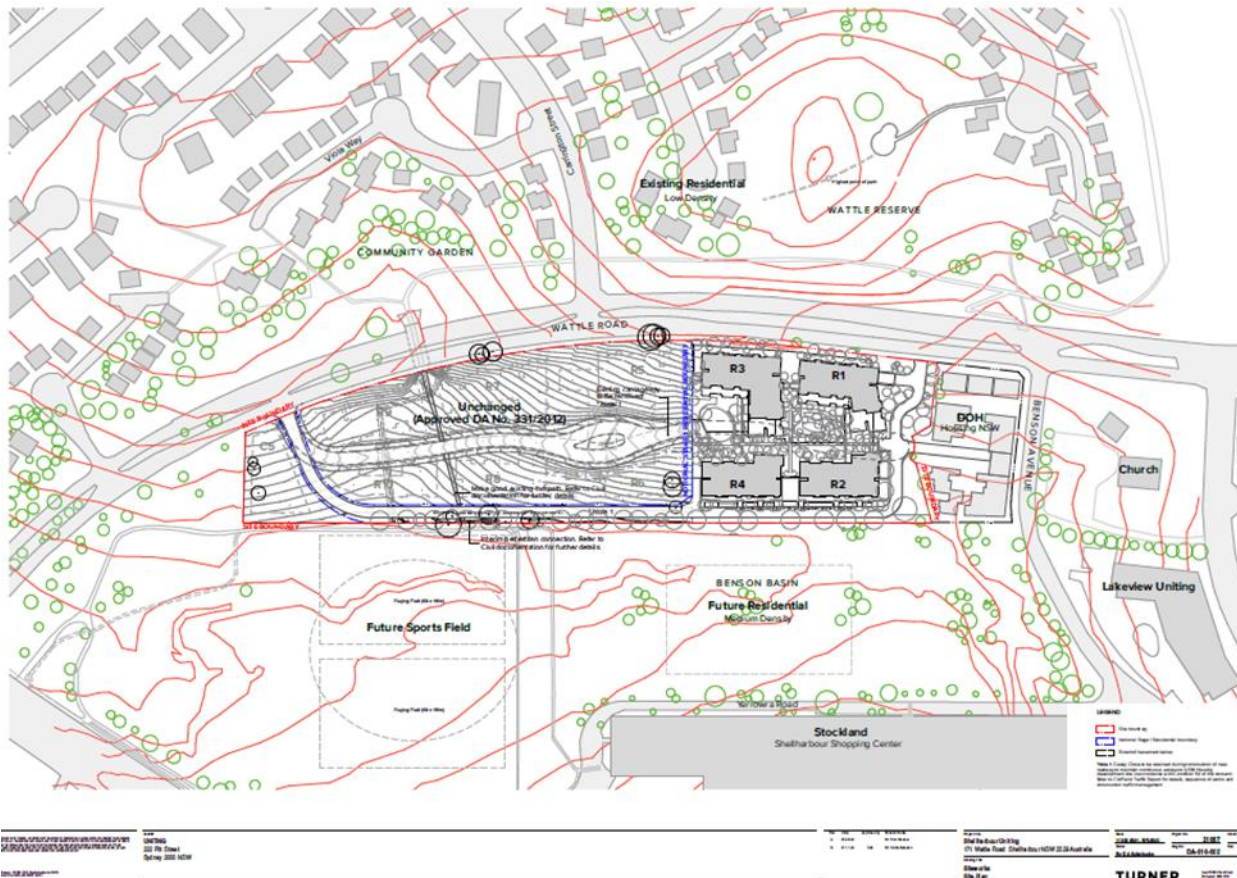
Site plan showing location and extent of Stage 1. Note – north is towards the left-hand side of the plan.
